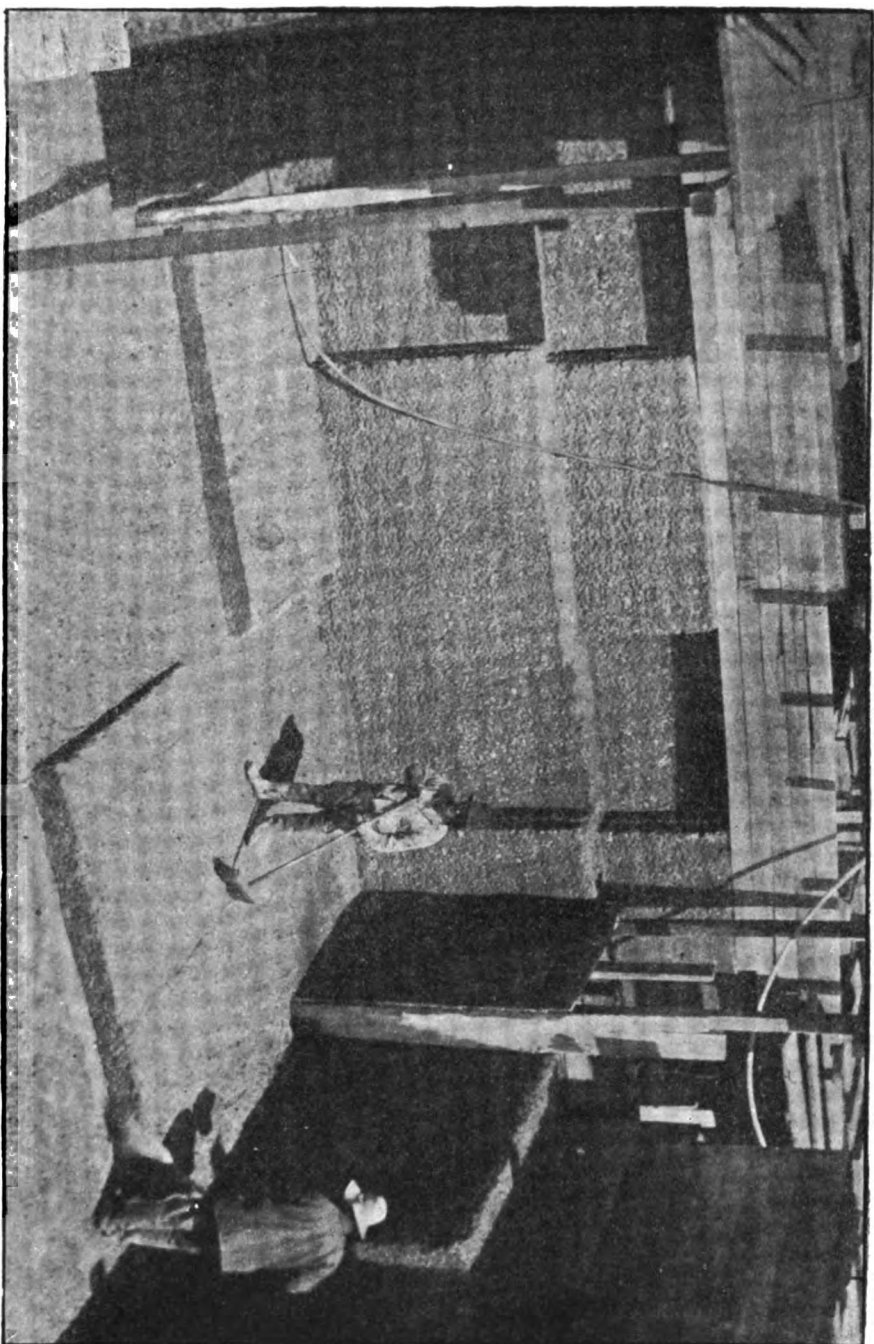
ROUGHENING SURFACE OF CONCRETE BLOCKS TO RECEIVE FRESH CEMENT, AT SAN MATEO DAM.
